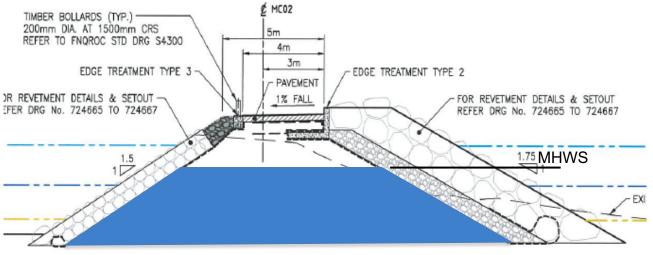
Stage 1 Existing Breakwater Reconstruction
